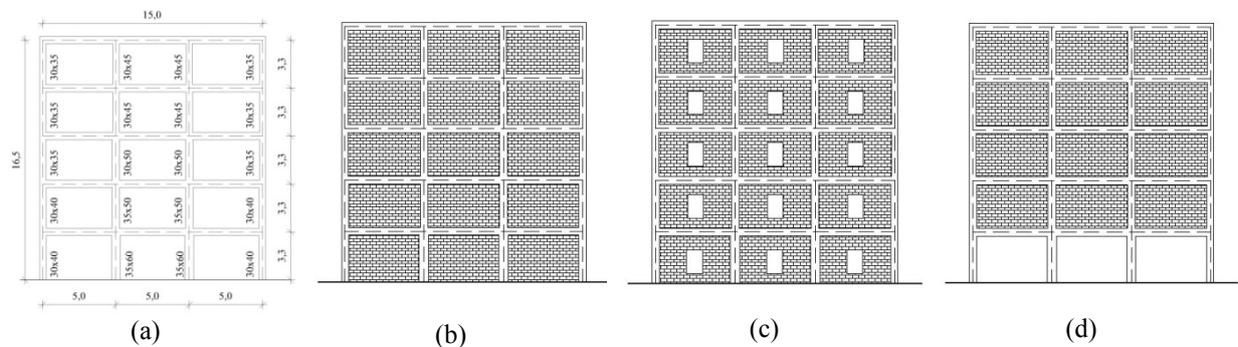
Examined frames: bare frame (a), totally infilled frame (b), totally infilled frame with openings (c) and infilled frame without panels at the ground floor (d).
